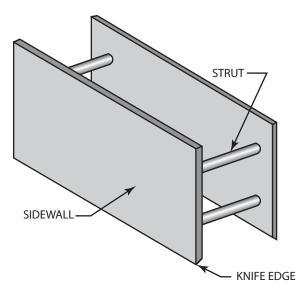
A metal trench box is a good way of securing the walls of excavations.
